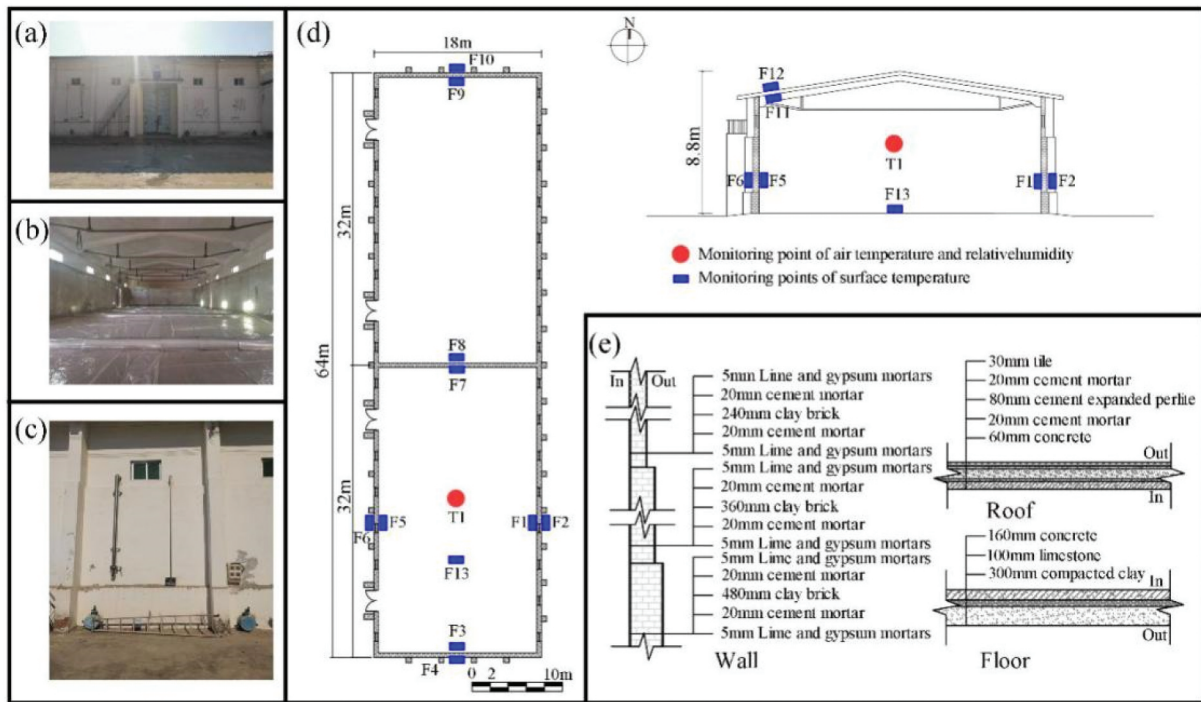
Architectural features of Modern horizontal warehouse: (a) Picture of the west facade; (b) Picture of inside of the warehouse; (c) Picture of the west wall, (d) Layout plan and section plan, and (e) Construction of envelope.
